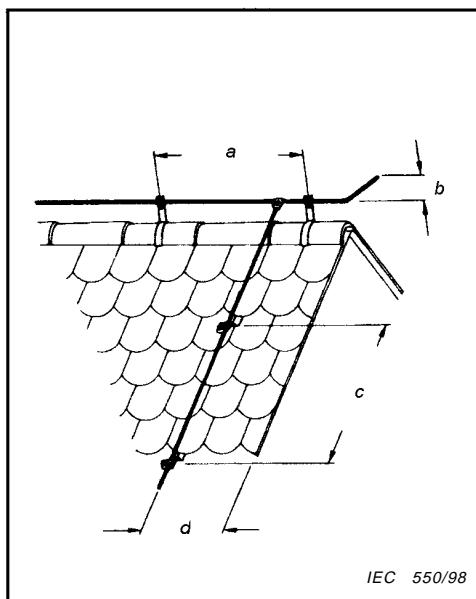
Construction of air-termination conductor on the ridge of a sloped roof and a roof down-conductor
